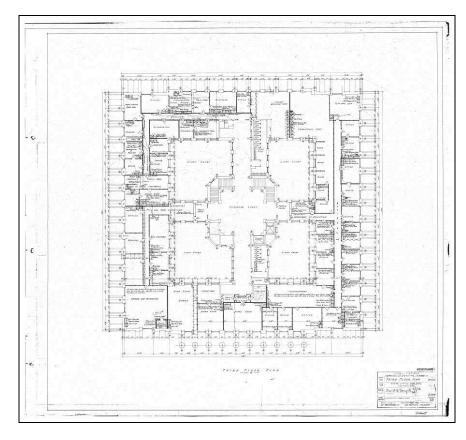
OB 1 Third Floor Plan. April 20, 1926.
